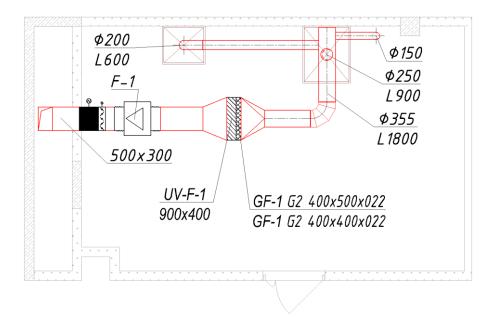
Floor Plan Fragment. Local Exhaust System with UV Filters
